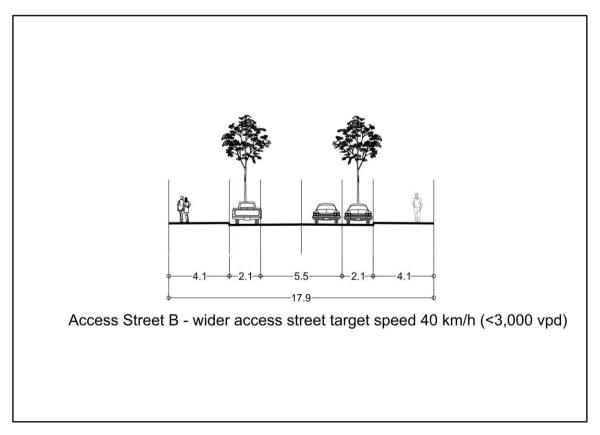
Access Street B (Liveable Neighbourhoods) - Typical Cross-Section
